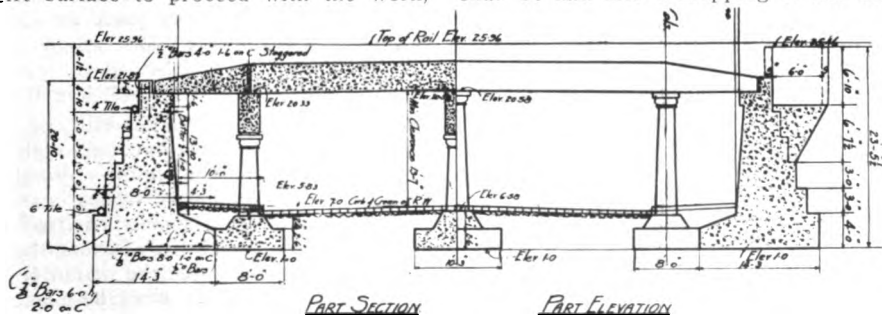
A. TWO DRAINS ARE INSTALLED ON EACH ABUTMENT.
